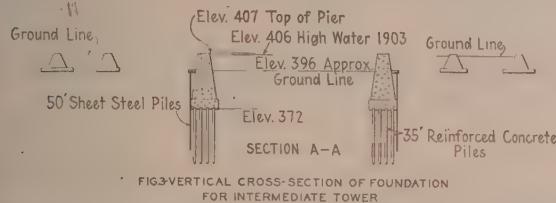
VERTICAL CROSS-SECTION OF FOUNDATION FOR INTERMEDIATE TOWER
